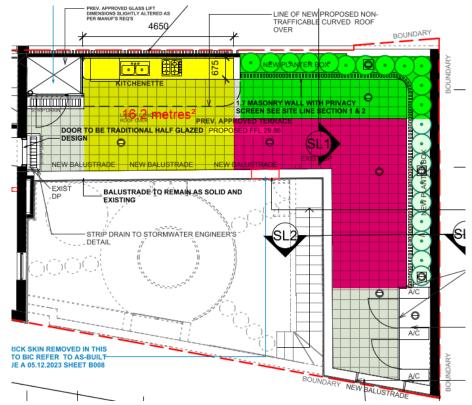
Proposed roof terrace design. Yellow indicates compliant private open space, green marks a non-trafficable area recommended to be enlarged through a condition, and pink highlights a trafficable area that does not meet the private open space dimensions (NTS).
